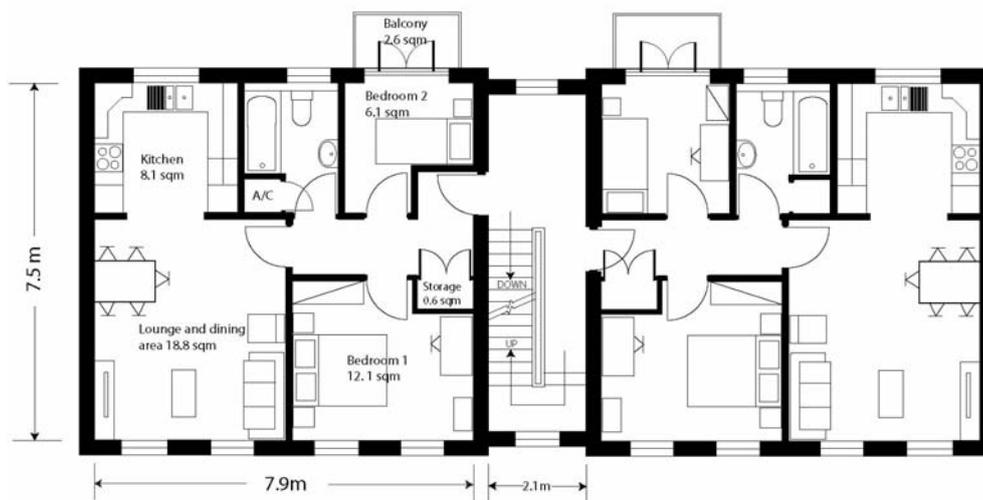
Volume house builder's typical first floor flat layout, Gross Internal Floor Area 59 sq metres
